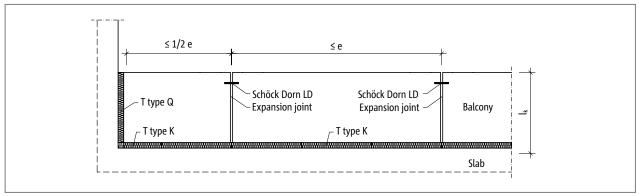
Schöck Isokorb® T type K: Expansion joint layout
